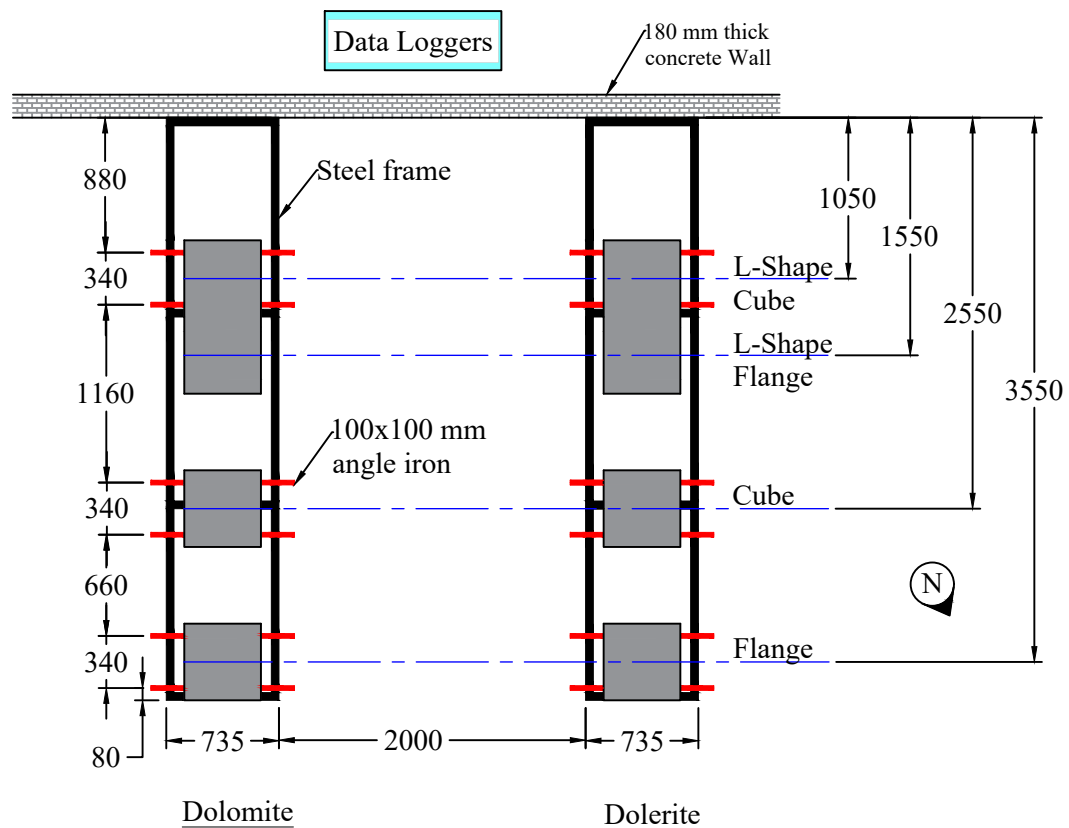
Layout of L-Shape, Cube, and Flange relative to 180mm thick concrete wall.
